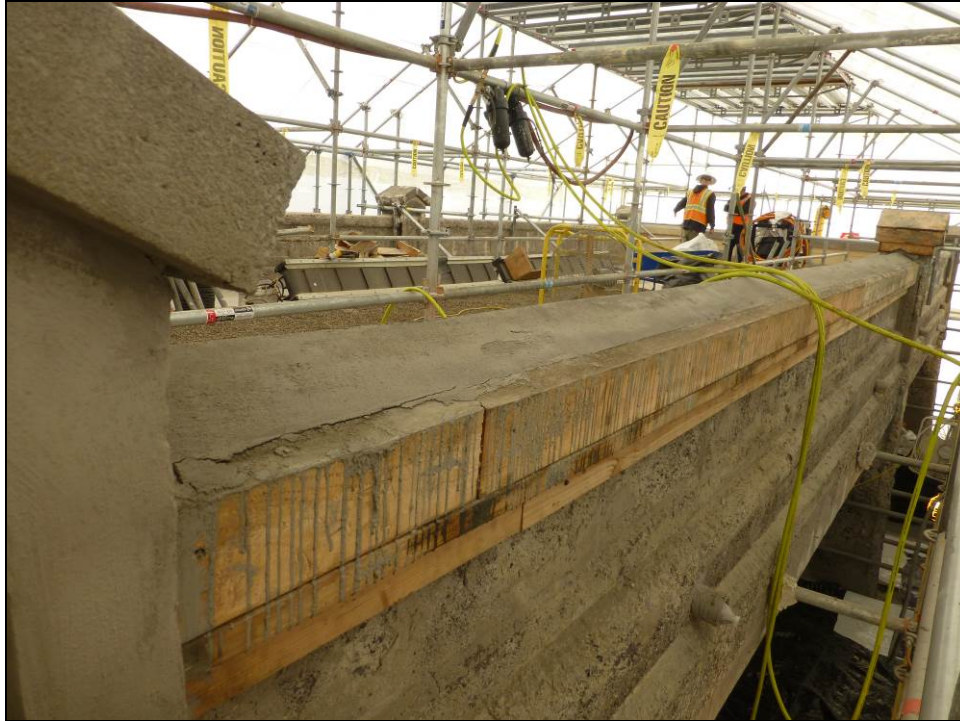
Additional wood forms used to reconstruct architectural detail on railings, May 18, 2016.
